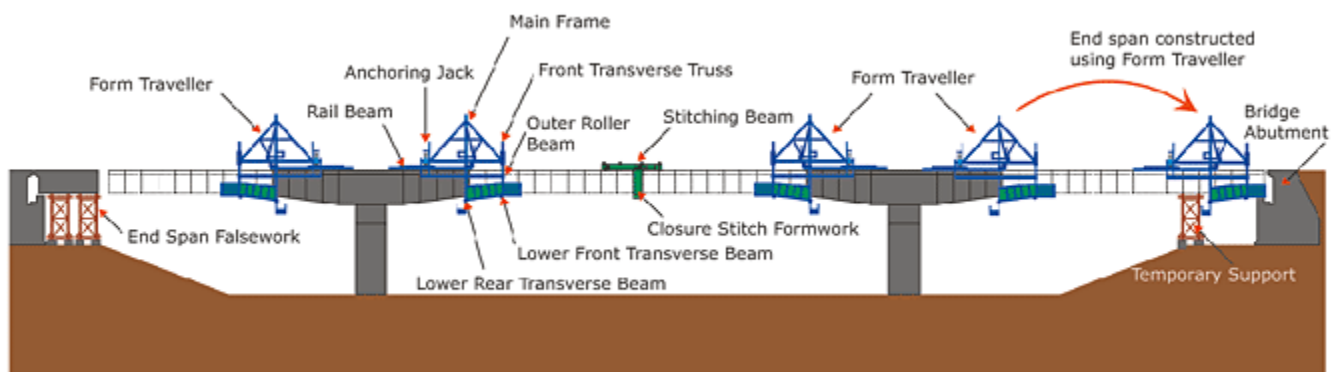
Balanced cantilever bridge construction methodology (Source: VSL systems <http://en.vsl.cz/free-cantilever-method/>)
